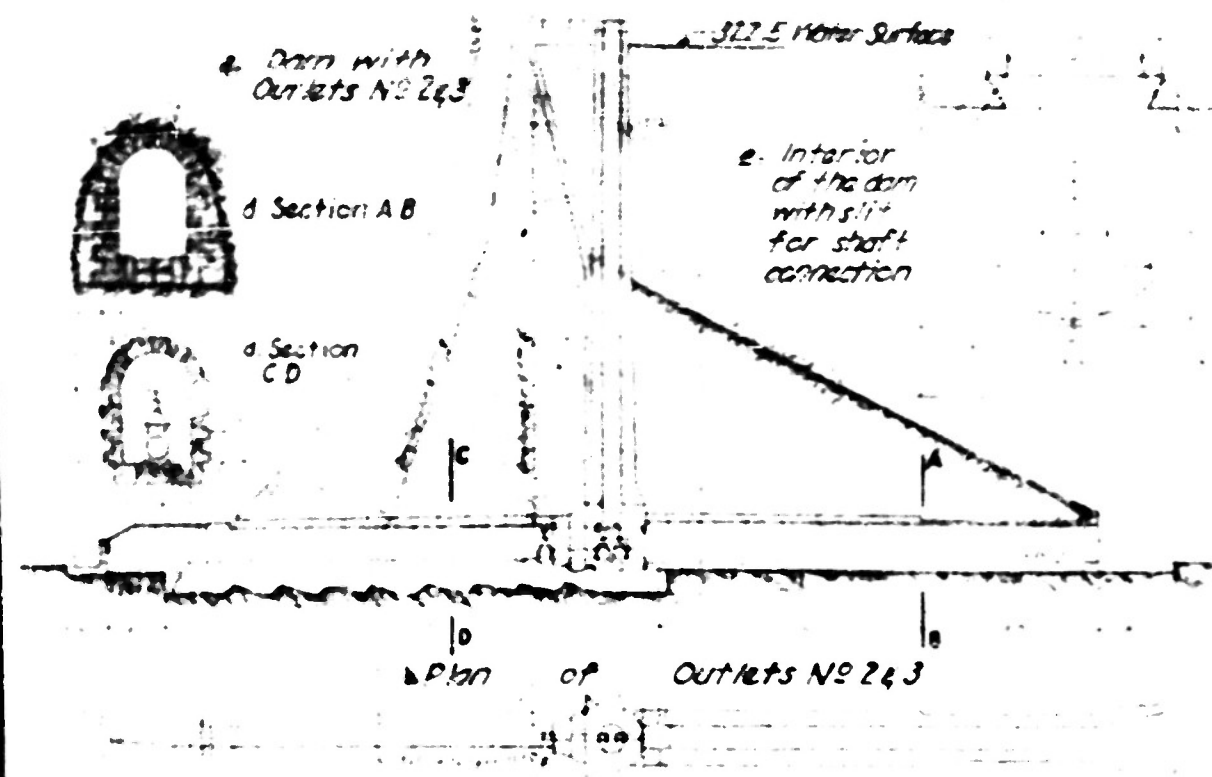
Fig. I: - CROSS SECTION OF DAM AT OUTLETS NO. 2 or 3
